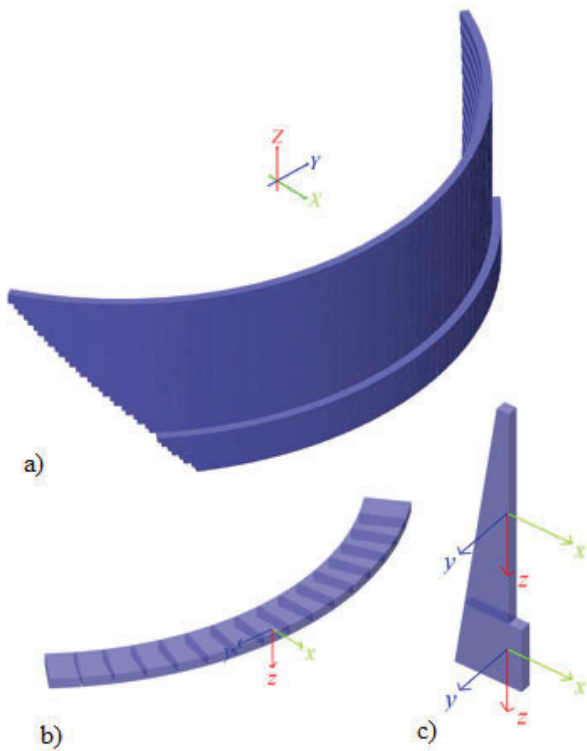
The dam structure (a), horizontal section/element-arch (b), vertical section/element-cantilever (c)
